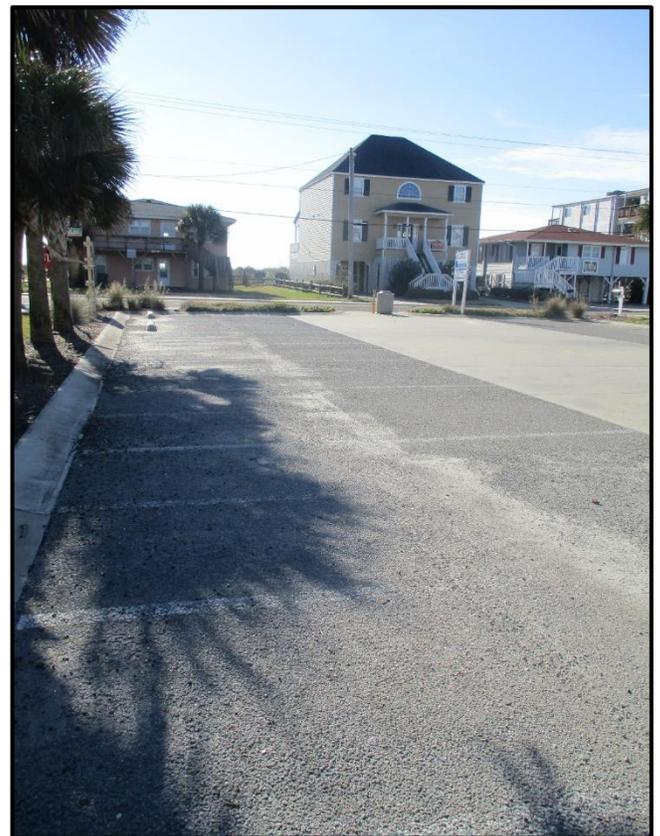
Pervious concrete pavement at a beach access parking lot at 53rd Ave North and Ocean Blvd.
